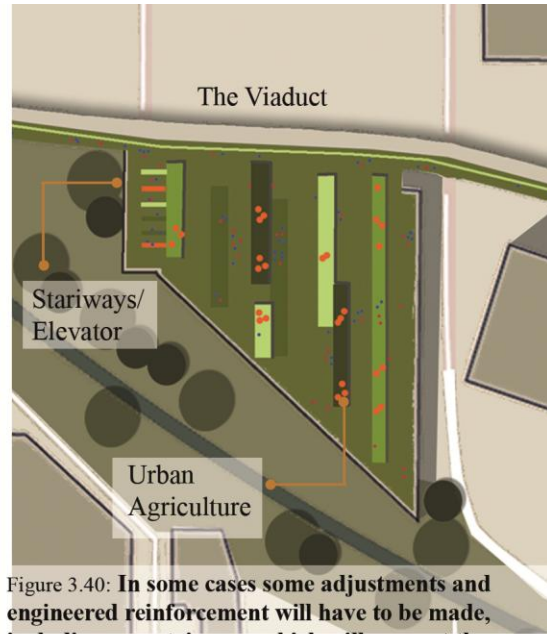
In some cases some adjustments and engineered reinforcement will have to be made, including new stairways which will connect the roofs to the streets.
